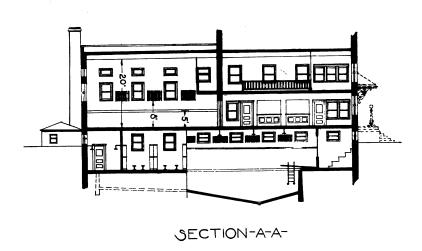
B. This Gymnasium Represents the Smallest Size Advisable. Running tracks are not recommended in rooms less than 50 feet wide.
